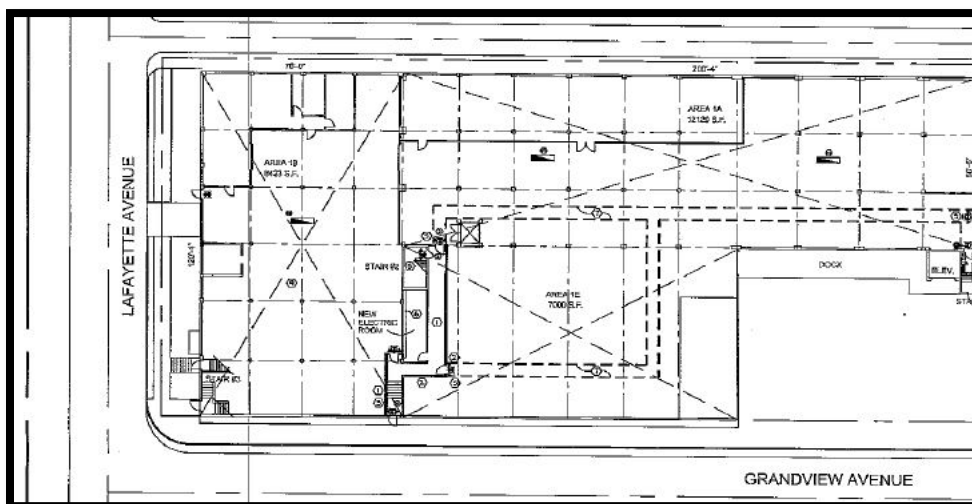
Grote Building First Floor - all three portions of the building have a first floor.
